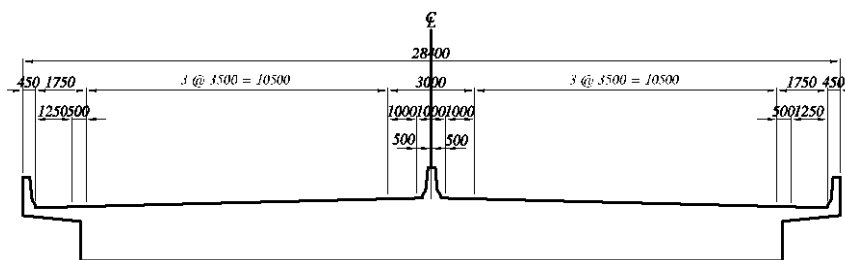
Typical Cross Section for Main Line Bridge (6-lane)
